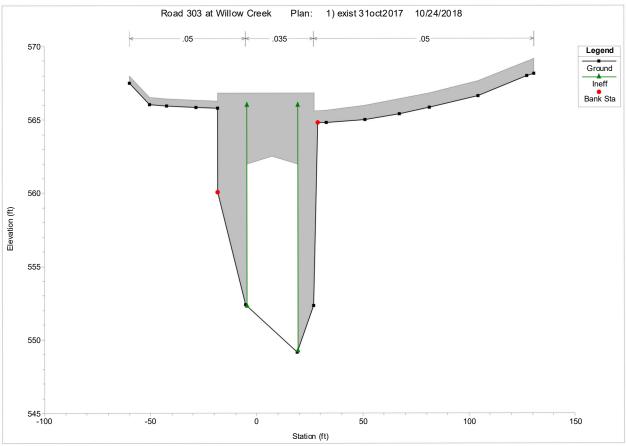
HEC-RAS upstream cross section of the existing bridge.
